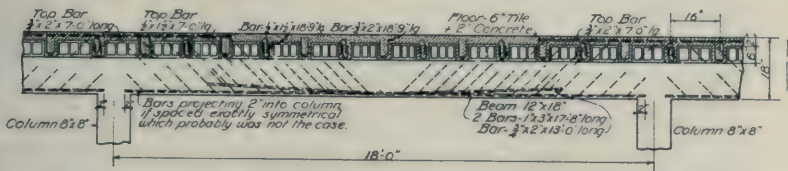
Detail of beam in Bixby Hotel, Long Beach, Cal.
